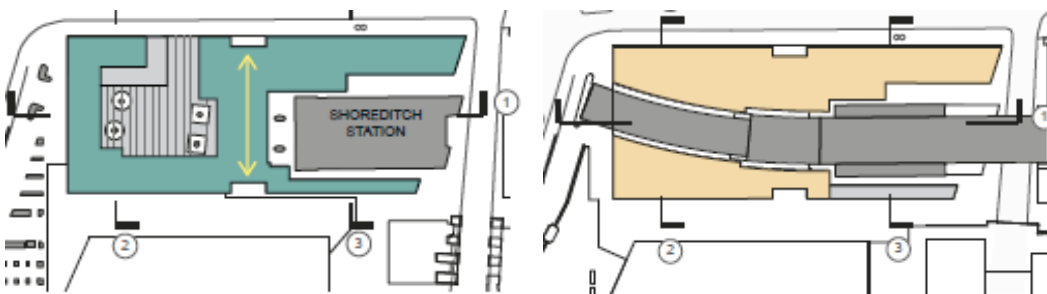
ground floor and lower level plans of Building 1 (max parameter) showing station and box within the structure
